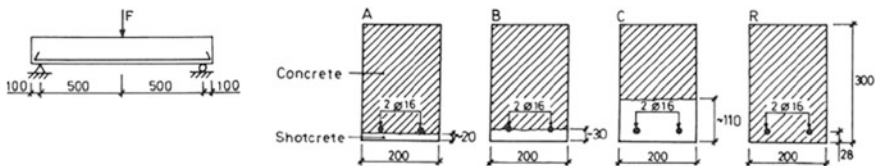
The set-up (*left*) and cross-section (*right*) of the tests on beams with shotcrete overlay. Dimensions in mm (Silfwerbrand 1989)
